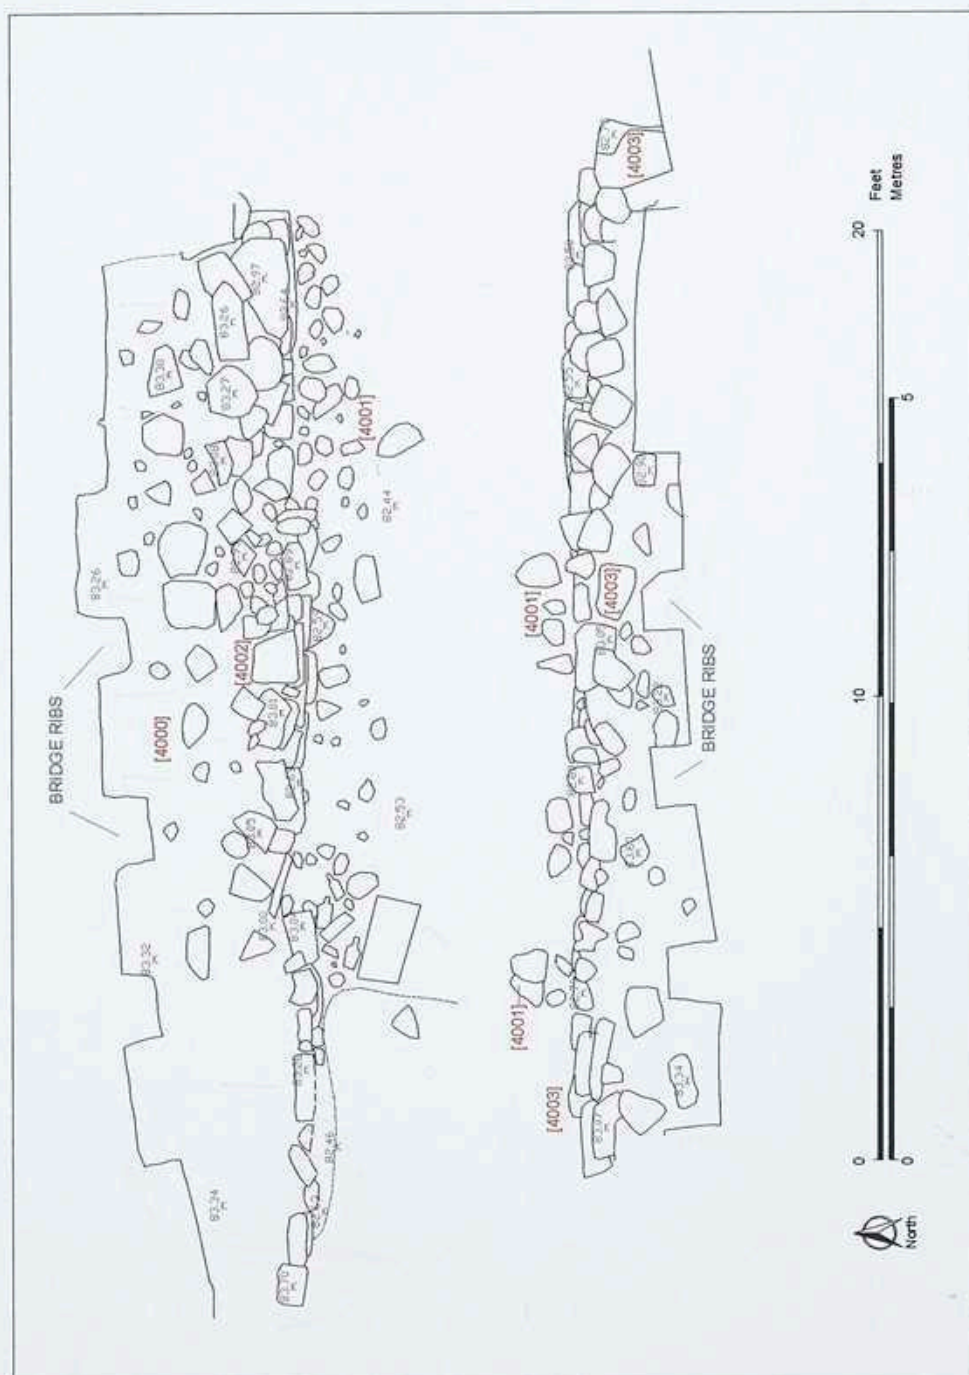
Trench 40, plan of revetting below road bridge. Scale (1:50).
